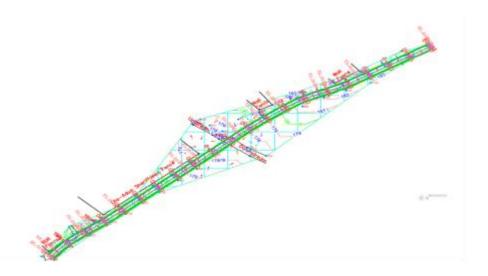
Engineering design (Survey and topographic map) of Ola Adua Site
